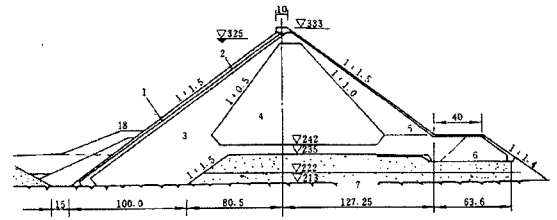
Zoning of Gudongkou CFRD (1. bedding zone, 2. transition zone, 3. main rockfill zone(limestone), 4. main rockfill zone(sand-gravel), 5. downstream rockfill, 6. large rock block zone, 7. alluvium, after Pan and He, 2000)
